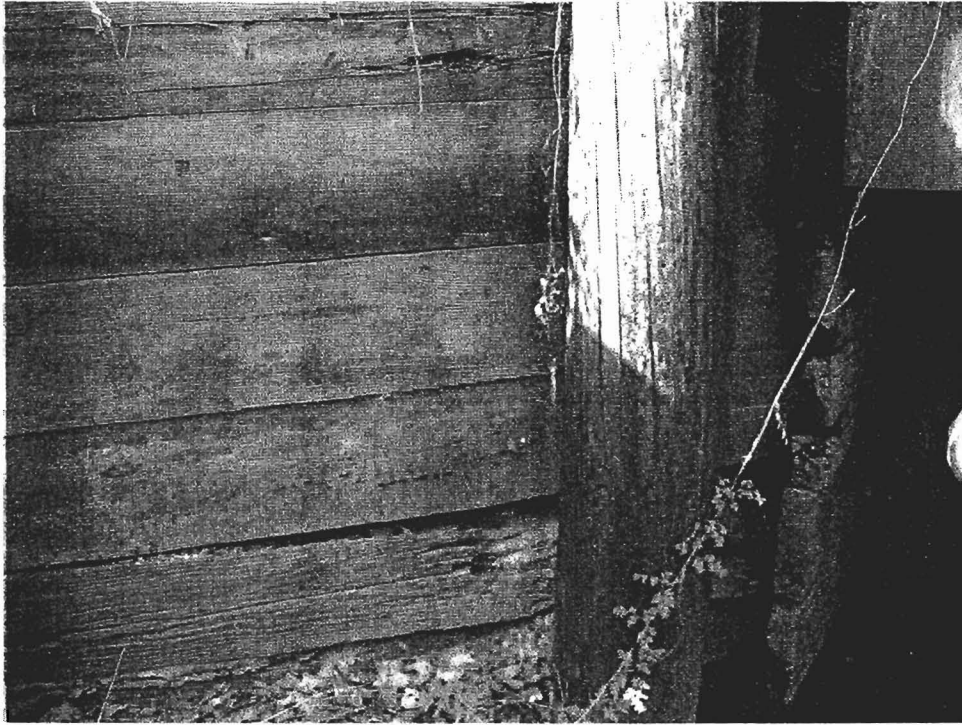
Decayed Sheeting in the Southwest Wingwall and at the South End of the West Abutment. Note Loss of Fill.
